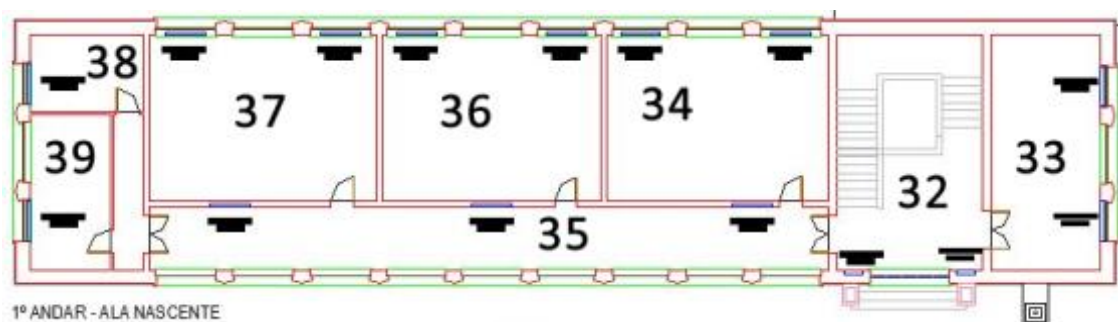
ROOMS USE IN BLOCK 2, FLOOR 1
